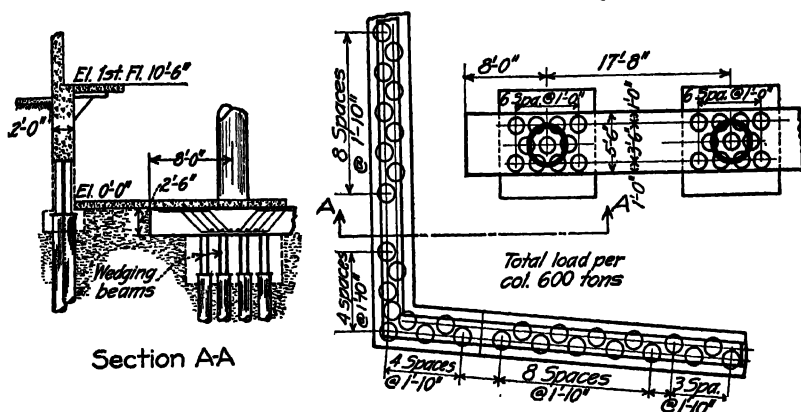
Typical pretest foundation (patented) as used for 17-story reinforced concrete building. Diameter of cylinders—14 to 20 in. Loading—350 to 500 lb. per sq. in. of cylinder cross-section.
